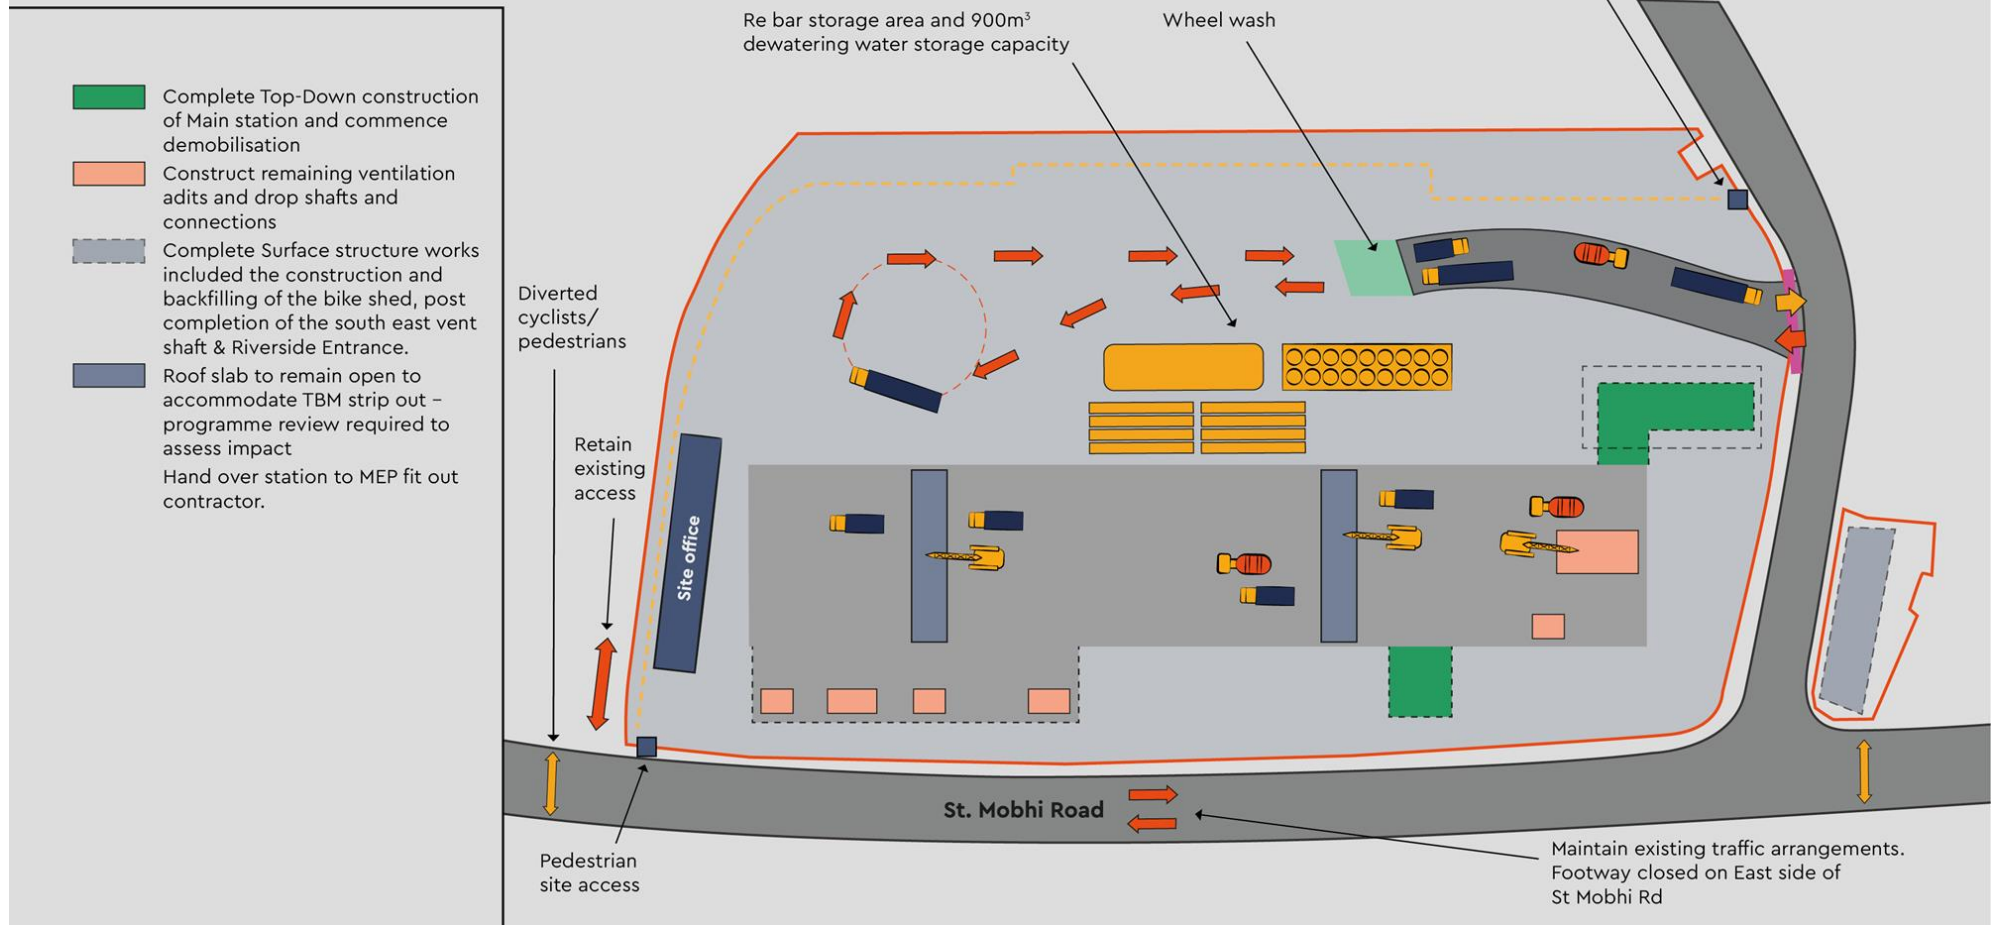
Griffith Park Station Stage 4 - Complete Top-Down Construction
